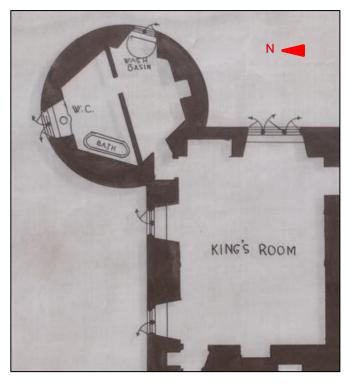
Extract from the 1909 floor plan showing the north-east room of the second floor
